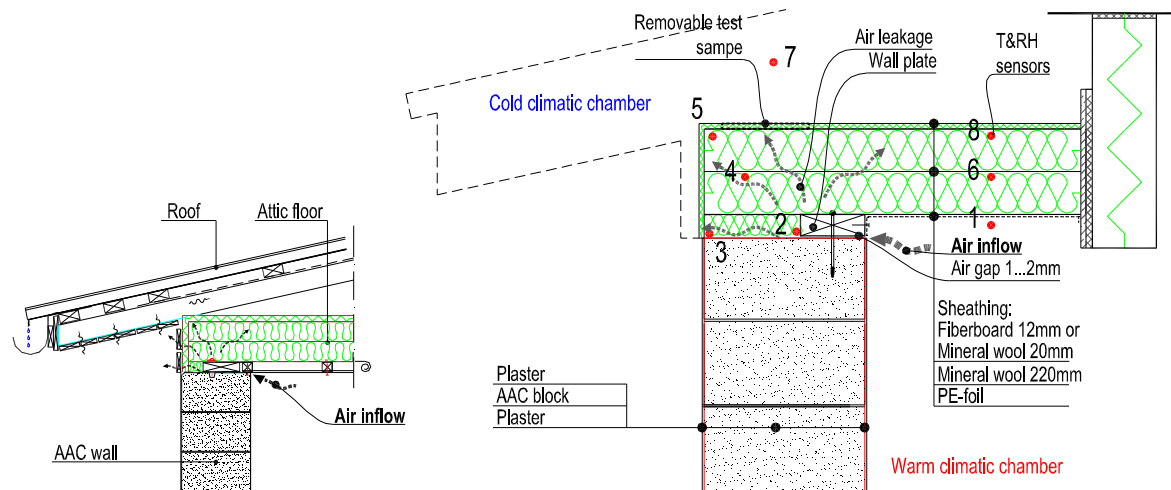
Studied autoclaved aerated concrete wall connection with attic floor (left) and the structure in laboratory conditions between climatic chambers (right). Temperature and RH measurement points are shown by red dots.
